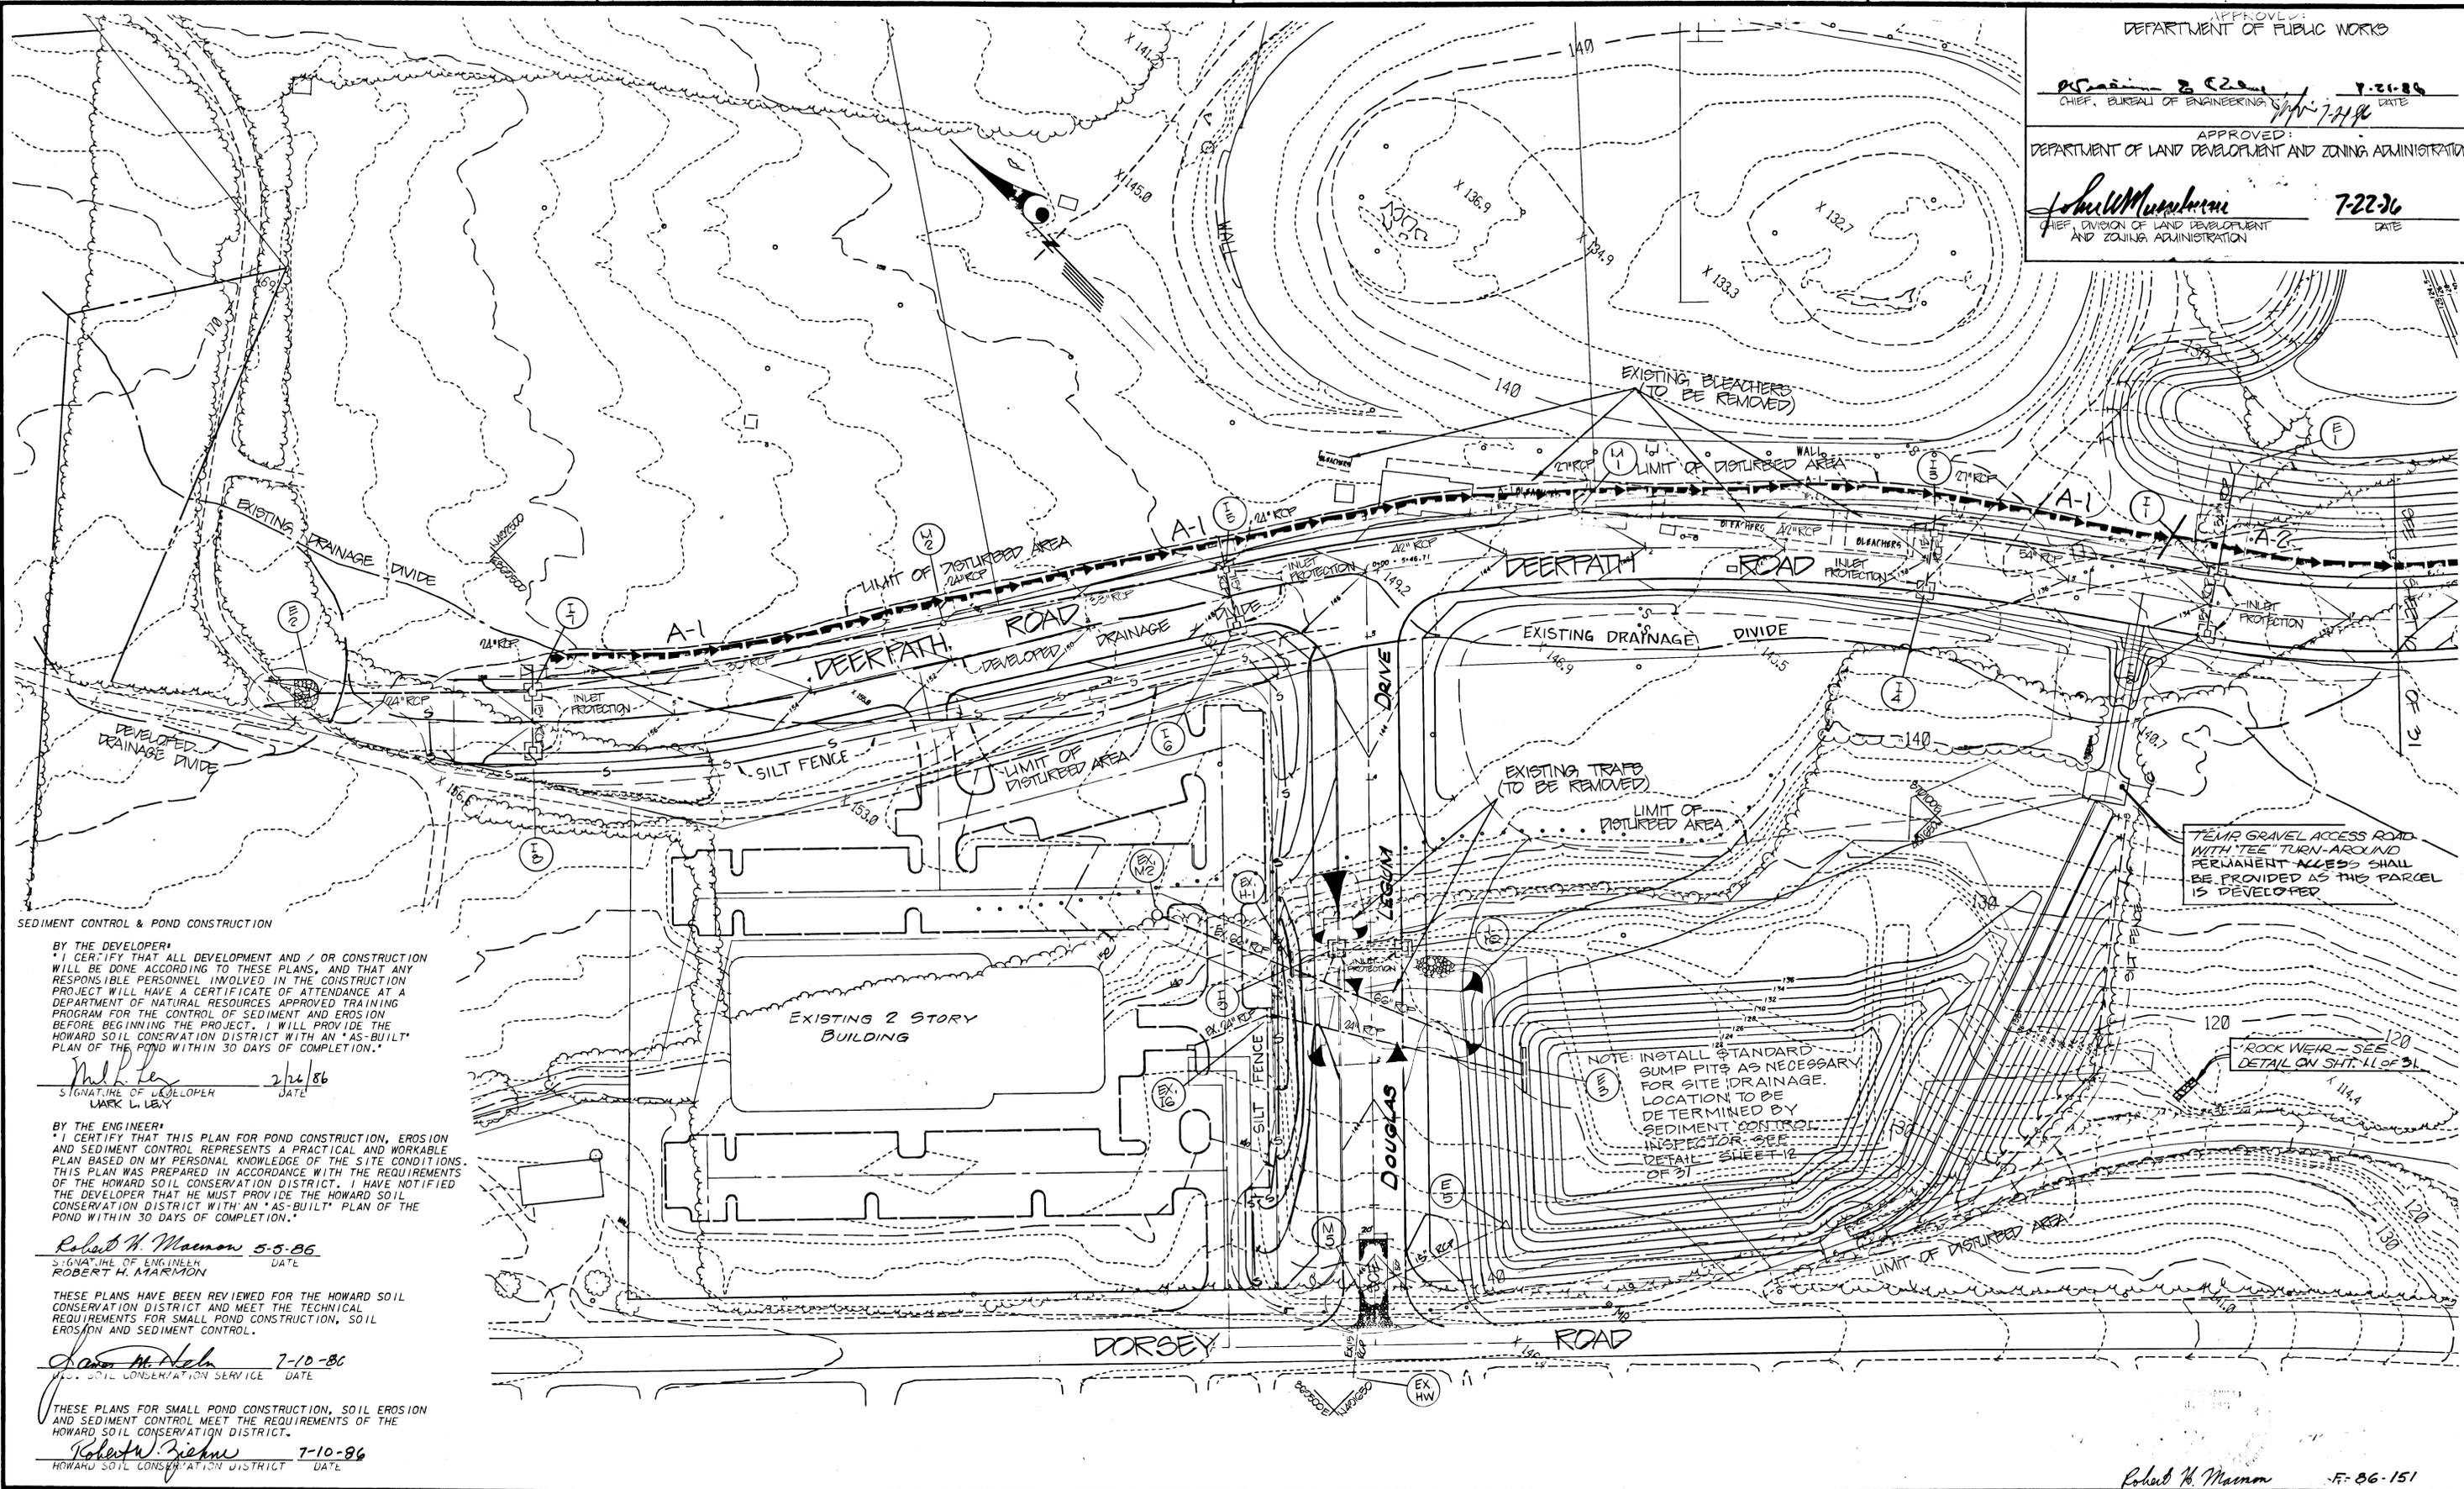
PLAN PROFILE (D.P. & S.A.) STANDARD
